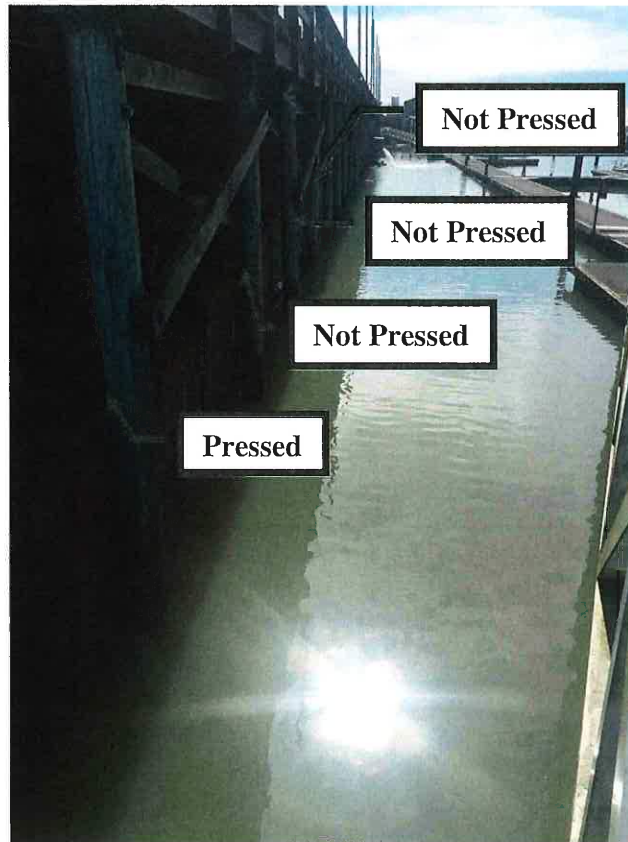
CONCRETE WALL SECTIONS PRESSED AGAINST SUPPORT COLUMNS
